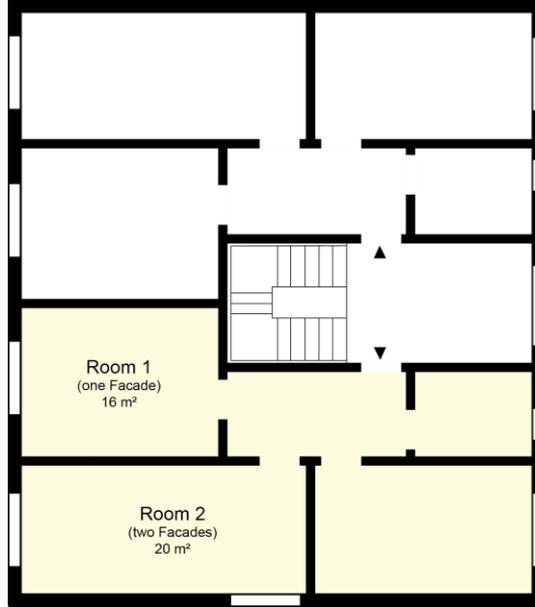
Floor plan of the modified model building (own illustration based on Schlitzberger et al. (2017))
